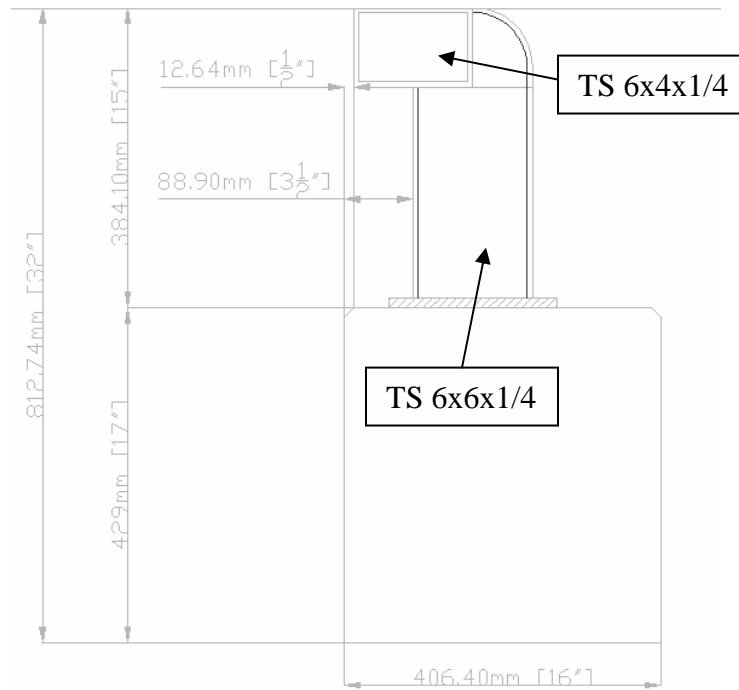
Proposed Annisquam River Bridge railing (cross section).
